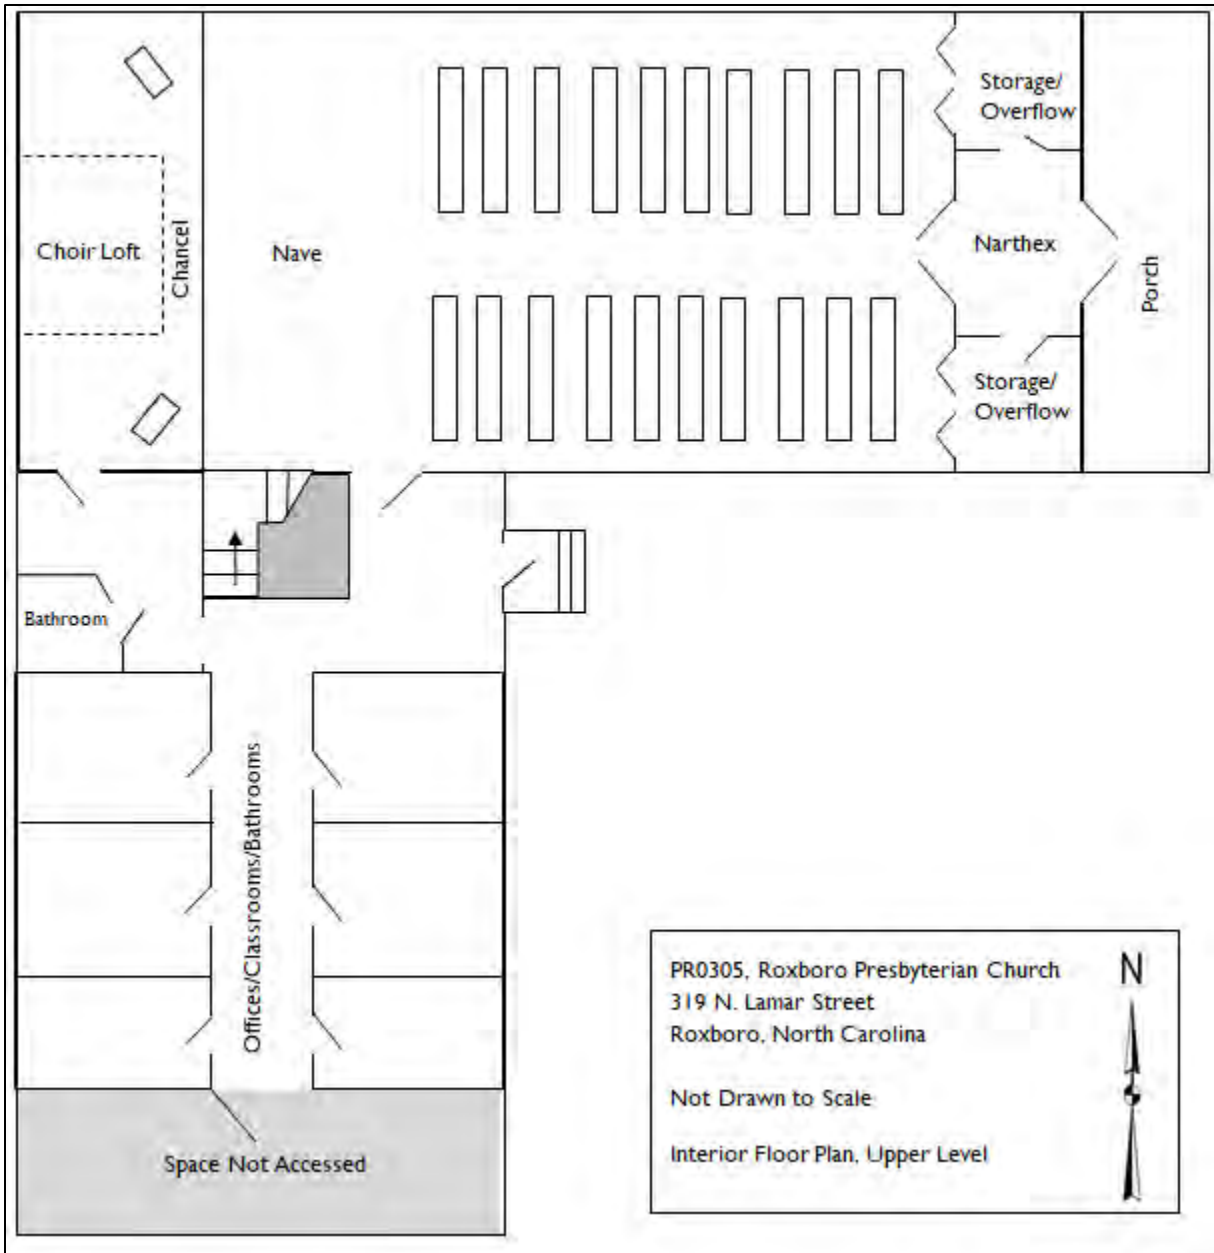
Roxboro Presbyterian Church (PR0305) Interior Floor Plan, Upper Level.
